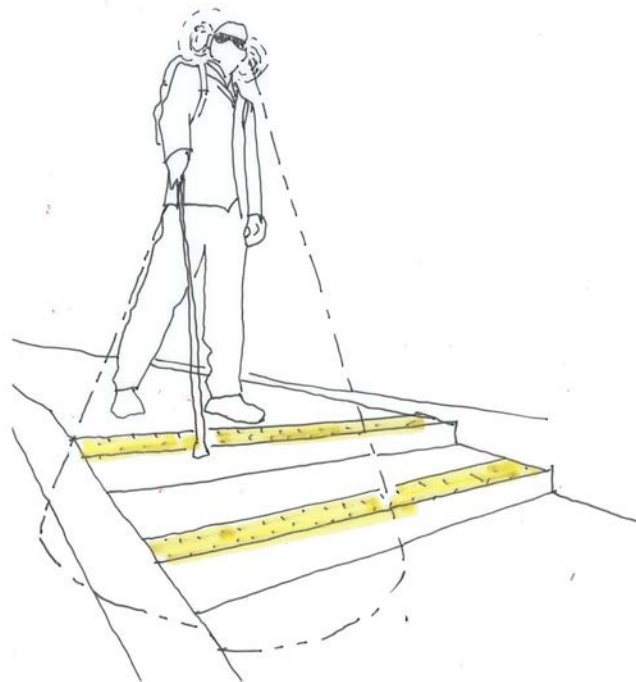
EASY ACCESSIBLE STAIRS. FLOOR FINISH INDICATORS
